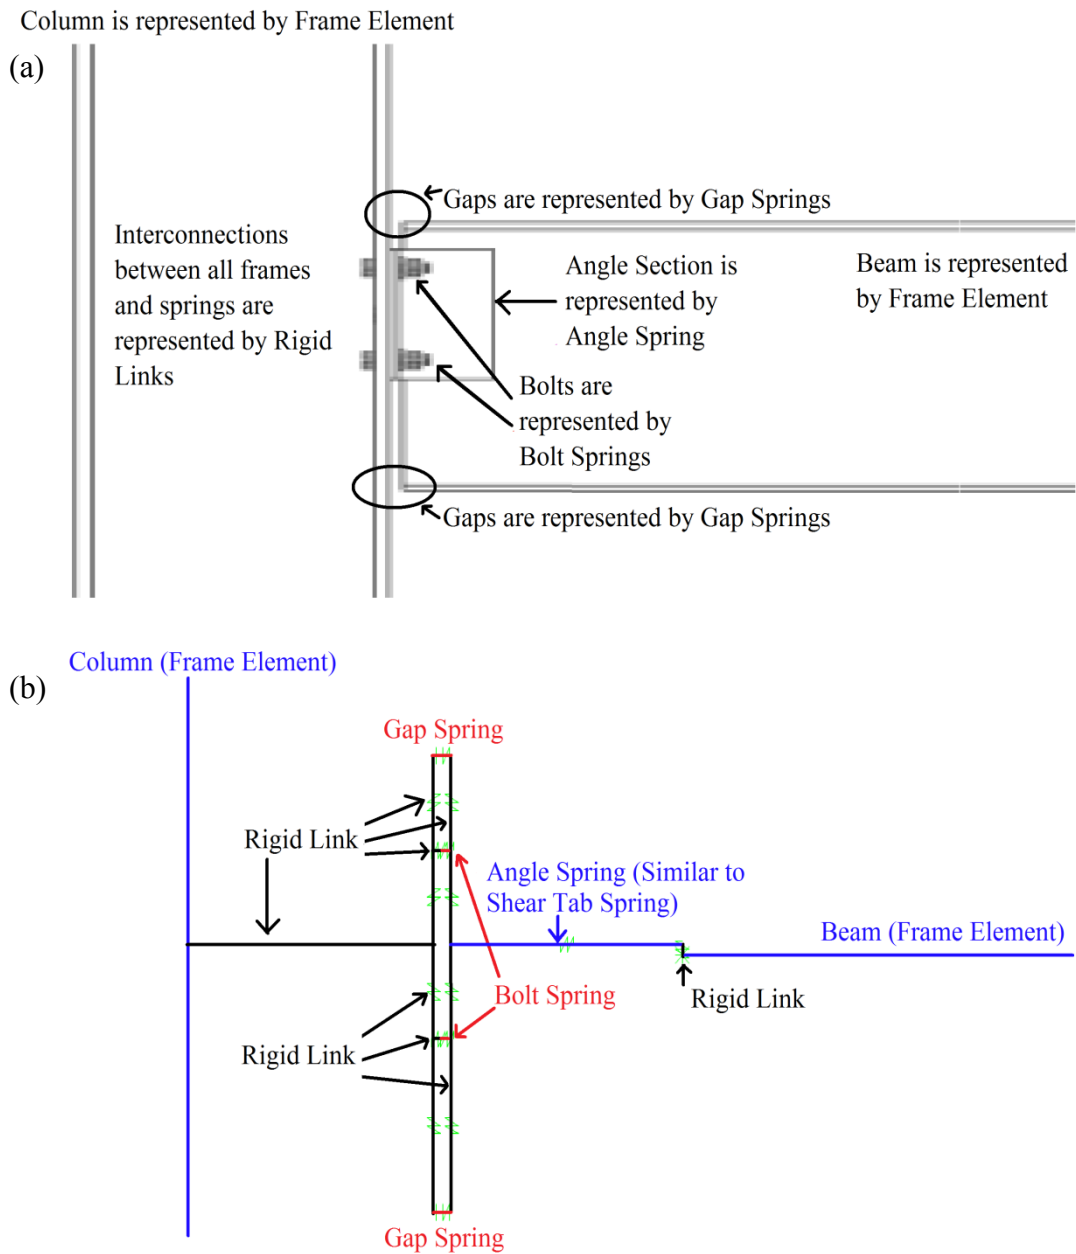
Beam-to-Column Double Angle Connection: (a) drawing of the connection; (b) simplified model of the connection
